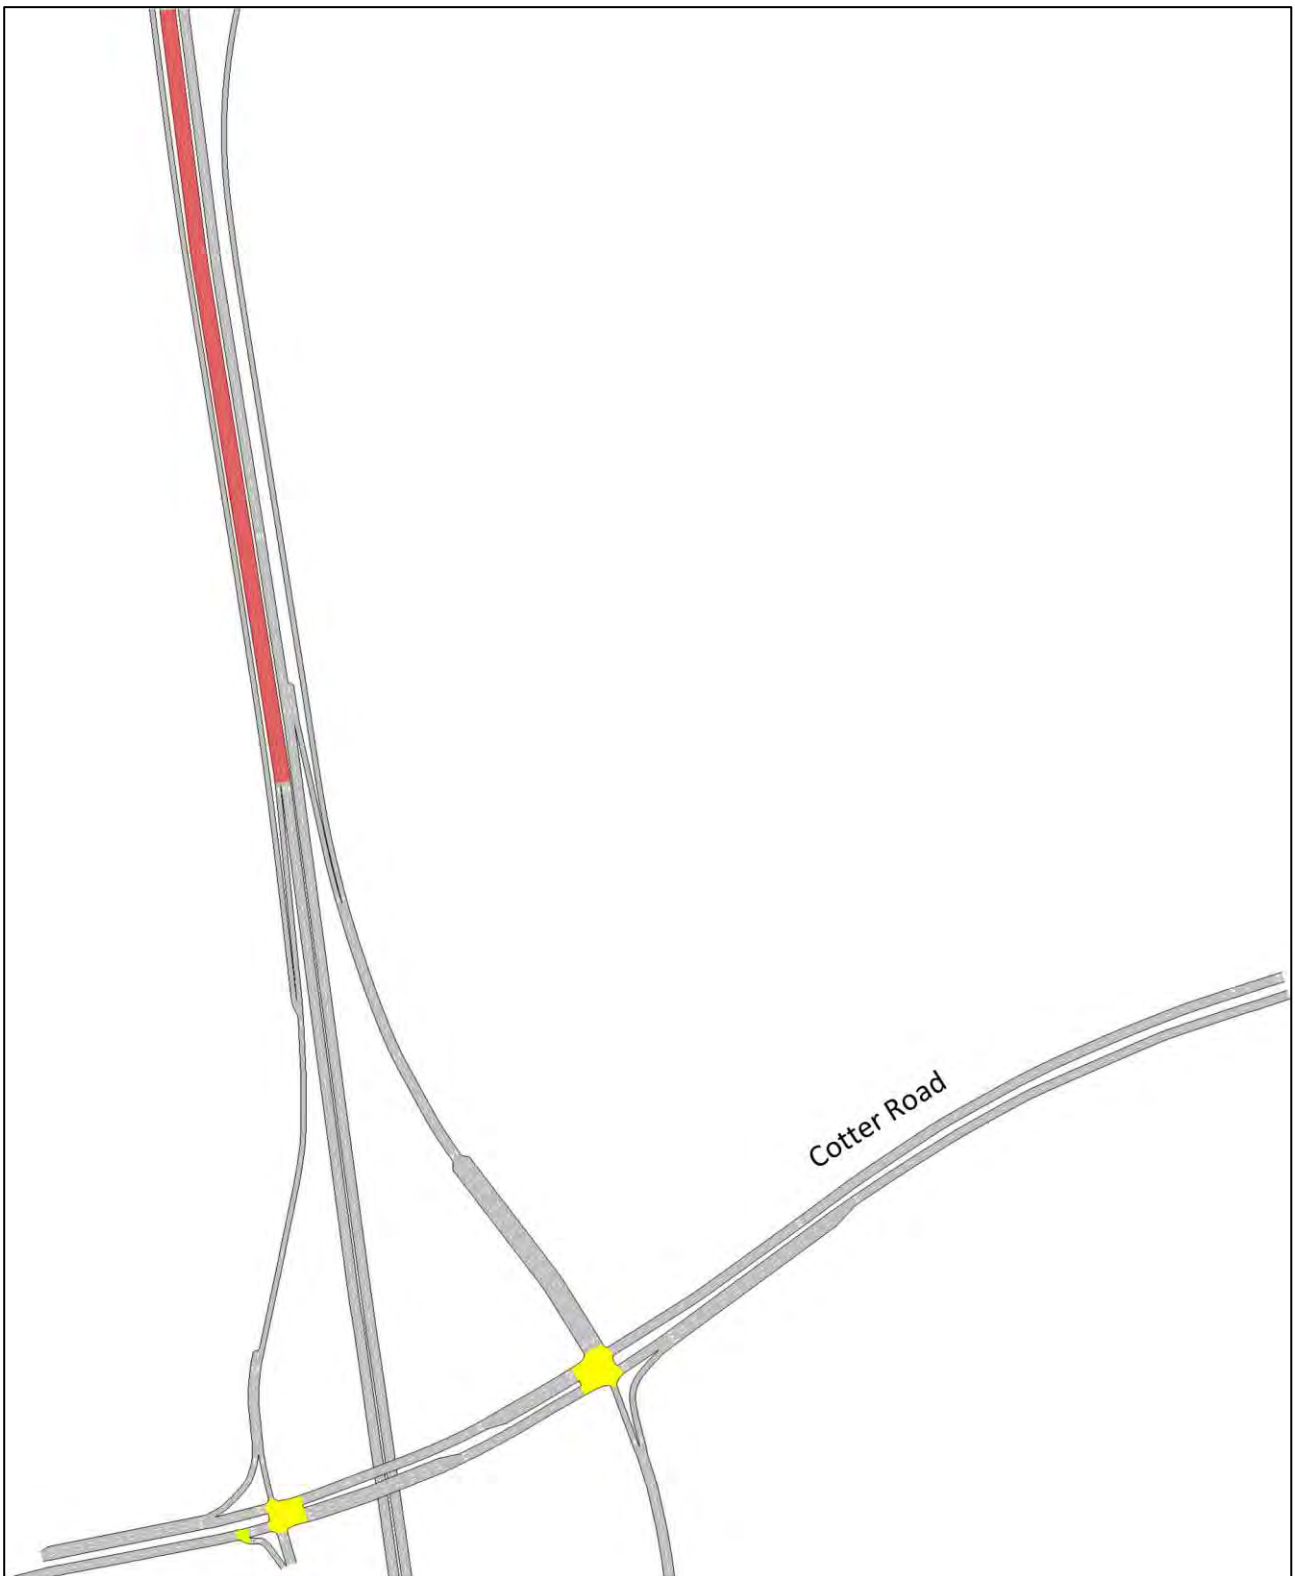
Tuggeranong Parkway Widening and Cotter Road SB Off-ramp Detail (Option 4)
